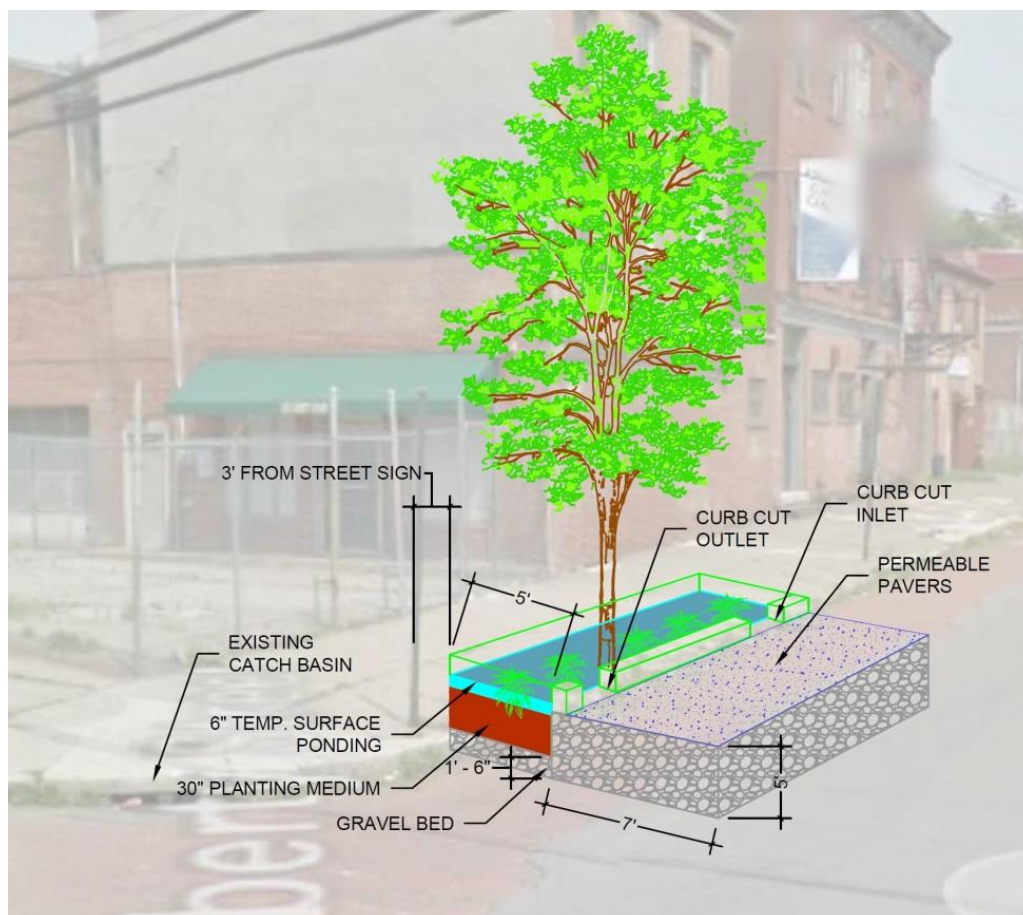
Rendering of right-of-way bioretention swale with permeable pavement over a gravel reservoir on Liberty Street in Newburgh, NY
